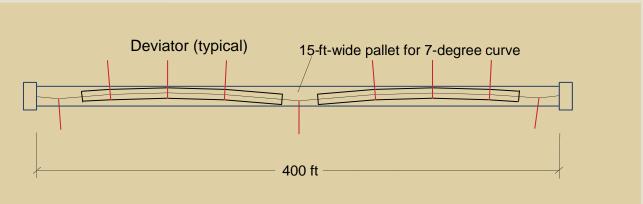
A 400-ft-long prestressing bed and a 15-ft-wide pallet are required to accommodate two 140-ft-long girders with curvatures up to 7 degrees or 700 ft radius. Note: 1 ft = 0.305 m.
